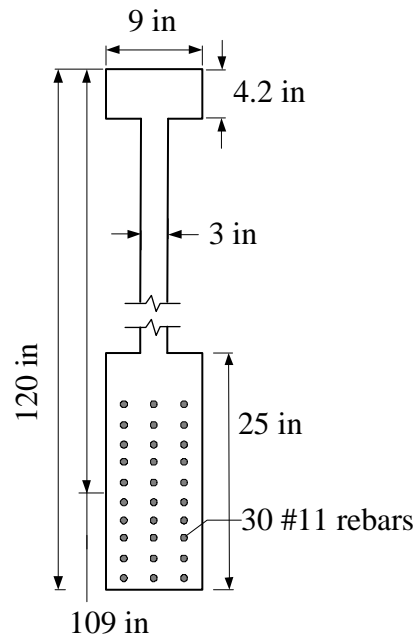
Section dimension and arrangement of longitudinal reinforcement steel rebars for section UHP/St60 120I-1
